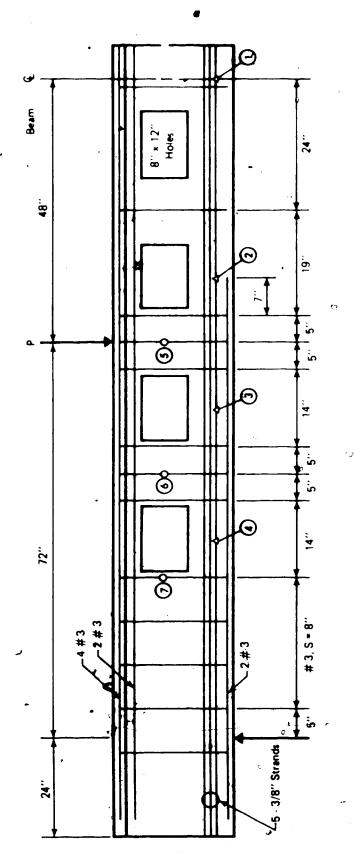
Reinforcement Details and Strain Gage Locations for Beam 15-12-6
